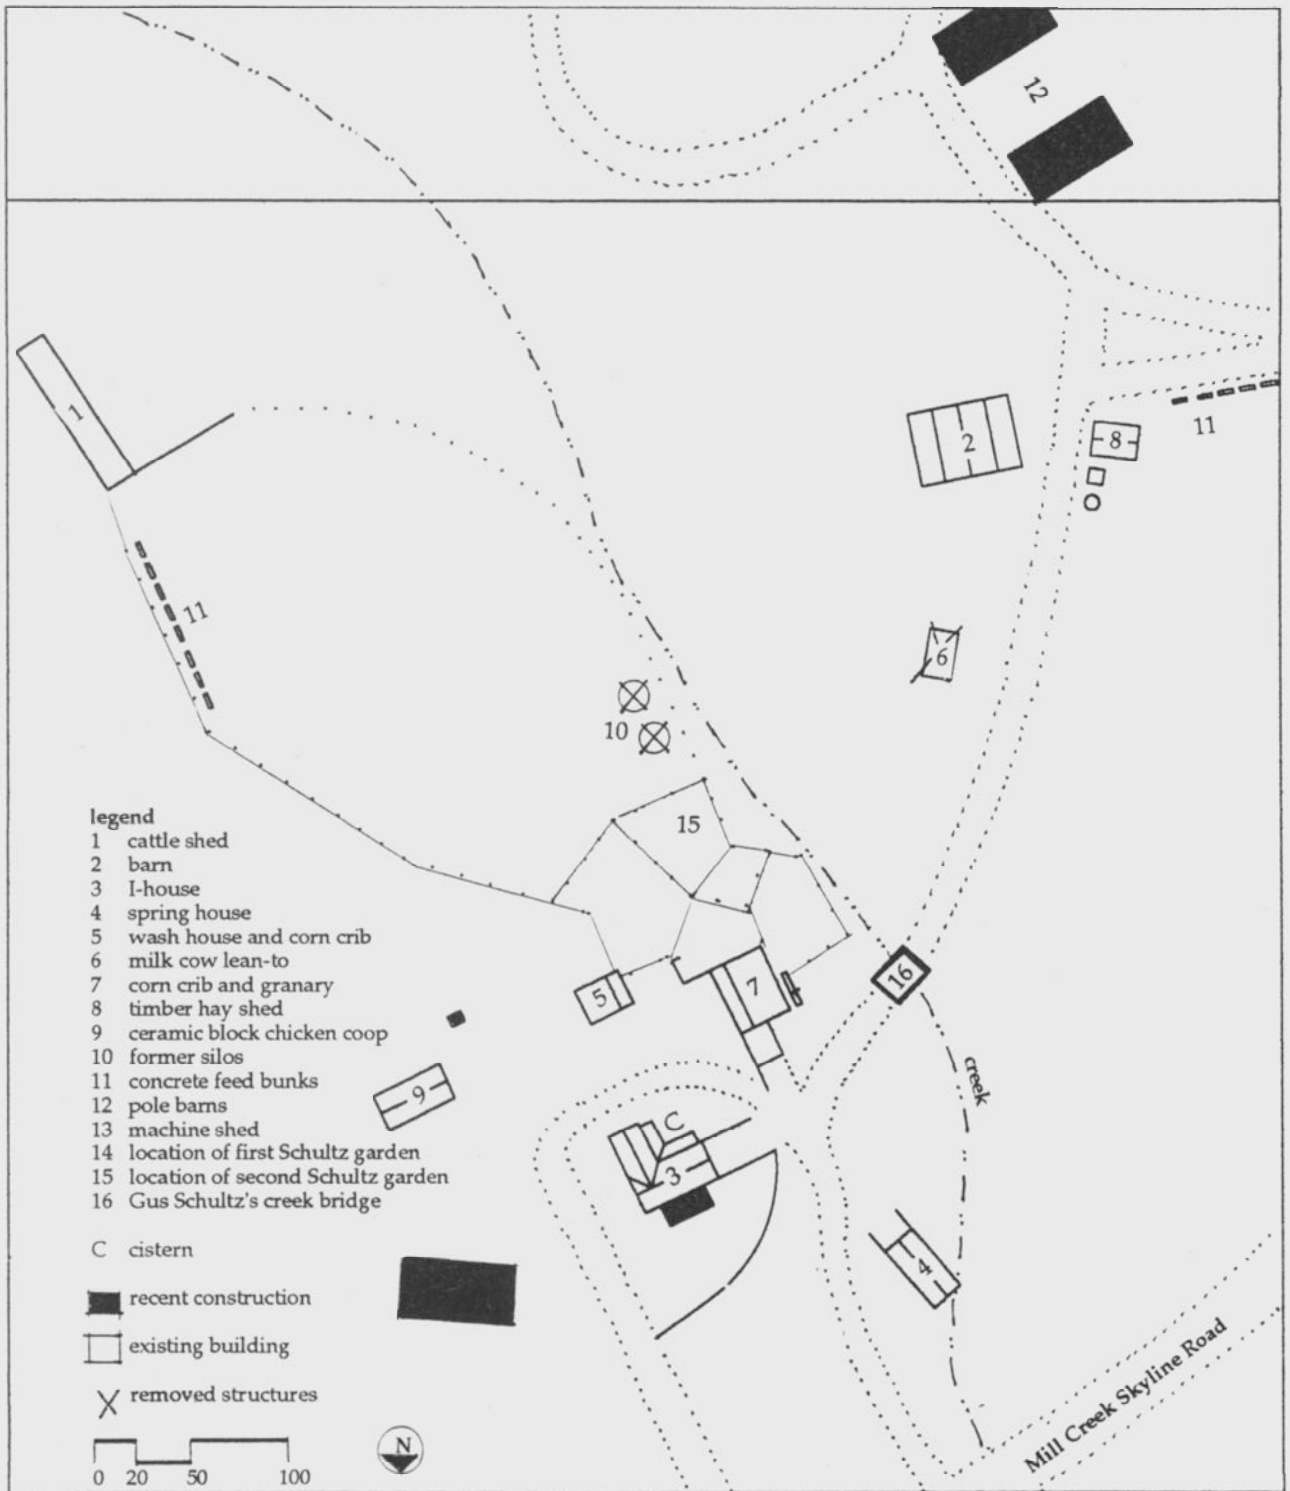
Site plan, Bill Schultz's I-house and outbuildings, 1975
